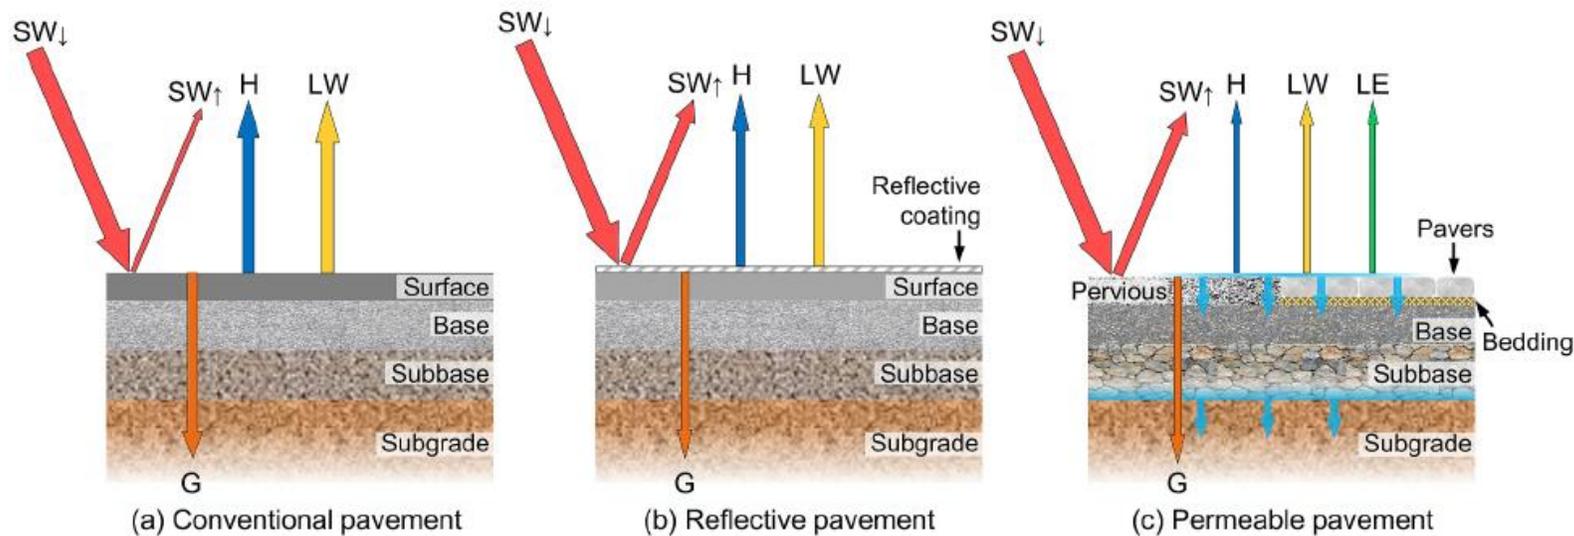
Structures of typical (a) conventional pavement, (b) reflective pavement, and (c) permeable pavement (pervious concrete or pavers, with infiltration shown in light blue). Arrows with letters in each subplot show the simplified energy balance for each pavement type: $SW_{\downarrow} - SW_{\uparrow} + LW = G + H + LE$, where SW_{\downarrow} , SW_{\uparrow} , LW , G , H , and LE denote downward shortwave radiation (solar radiation), upward shortwave radiation (reflected), net longwave radiation, heat conduction, sensible heat flux, and latent heat flux, respectively.
